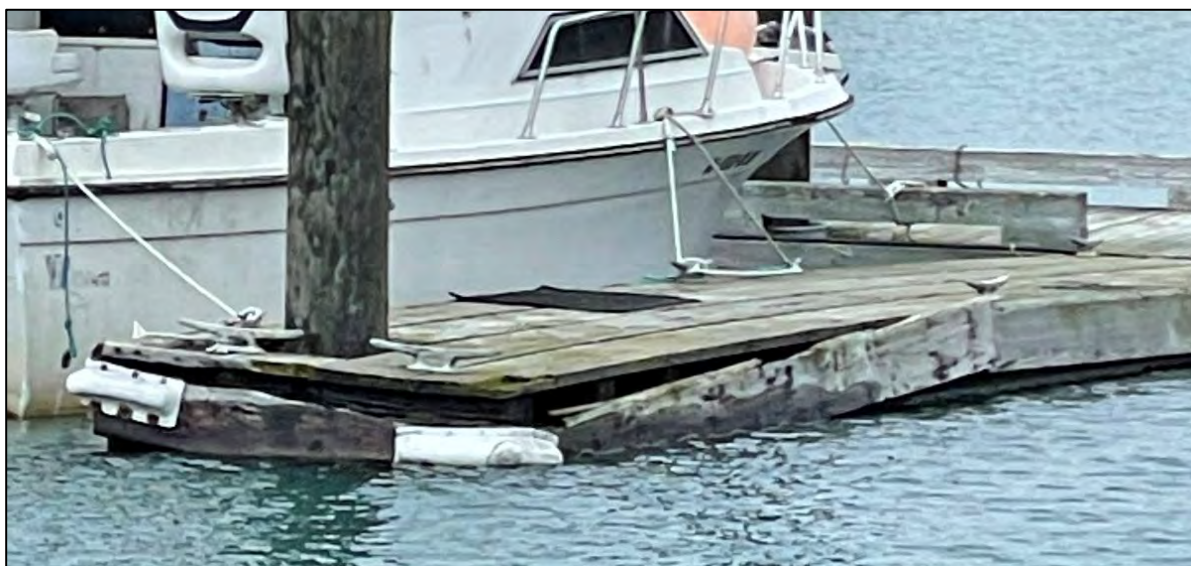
Stall Float on CC Float with damaged timber waler, rubboard, and decking.
